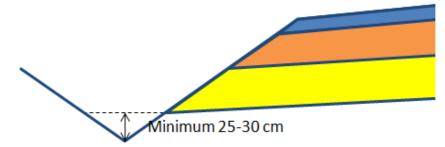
The bottom of the drainage system should always be at least 25 - 30 cm lower than the bottom of the road structure.
